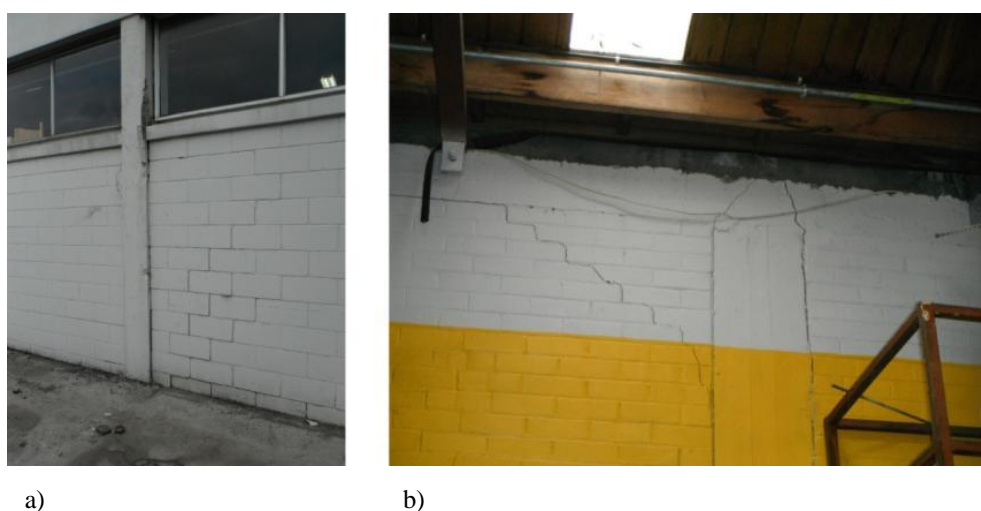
Observed damage on masonry infills after the 22nd February 2011 Christchurch earthquake: a) Short column, b) Diagonal cracking
